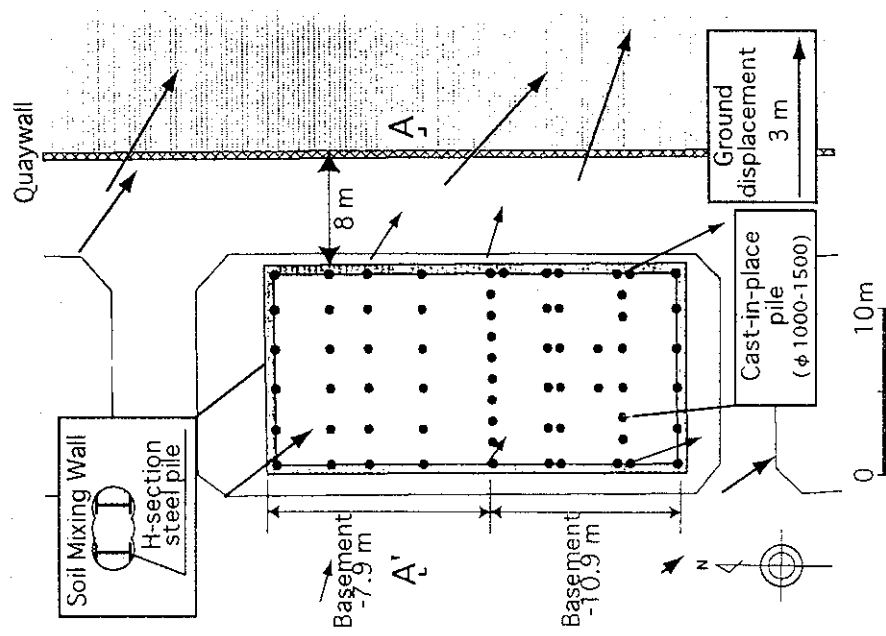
Plan of Shimagami Pumping Station and Liquefaction-Induced Ground Displacement (Hamada and Wakamatsu 1996)
